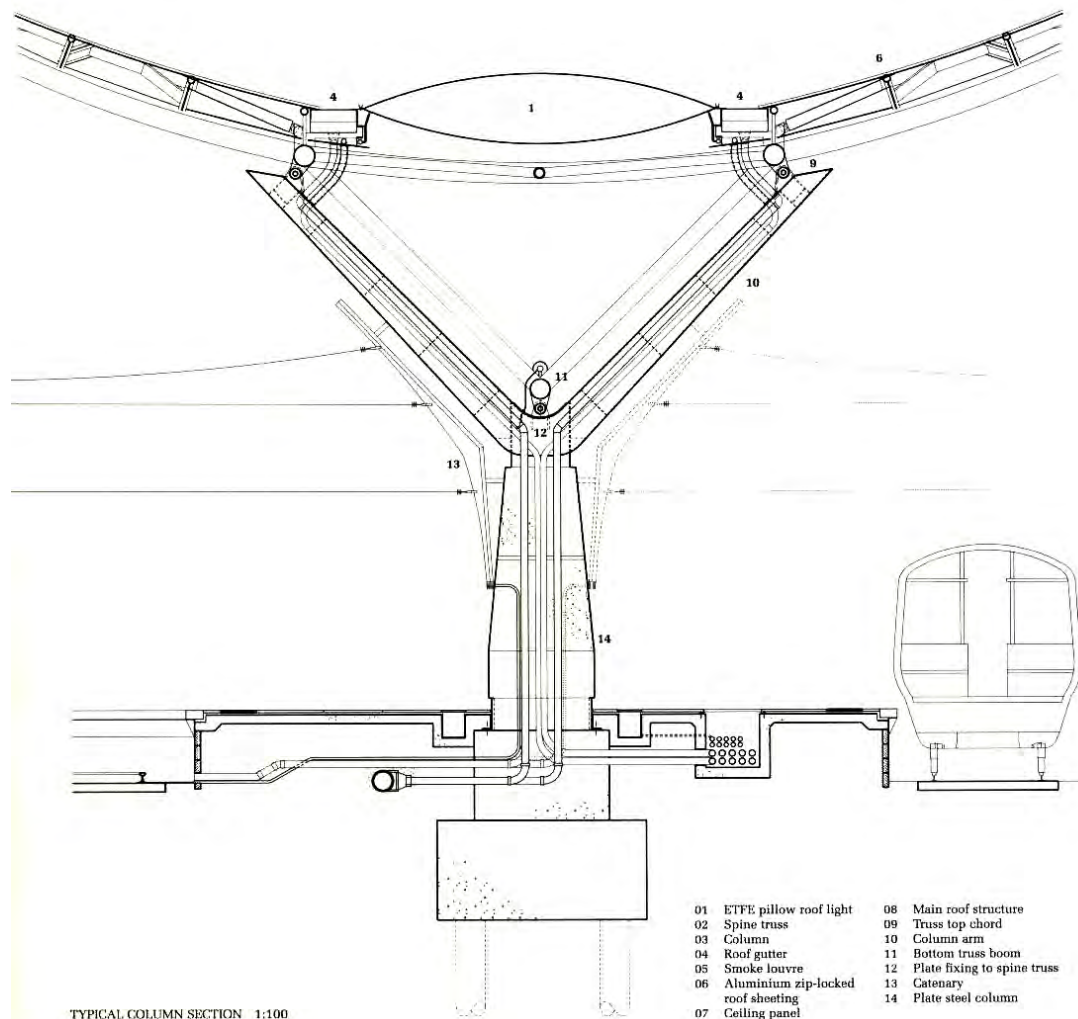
A typical section through the column with the roof light above (Raisbeck, 2007: 53)
